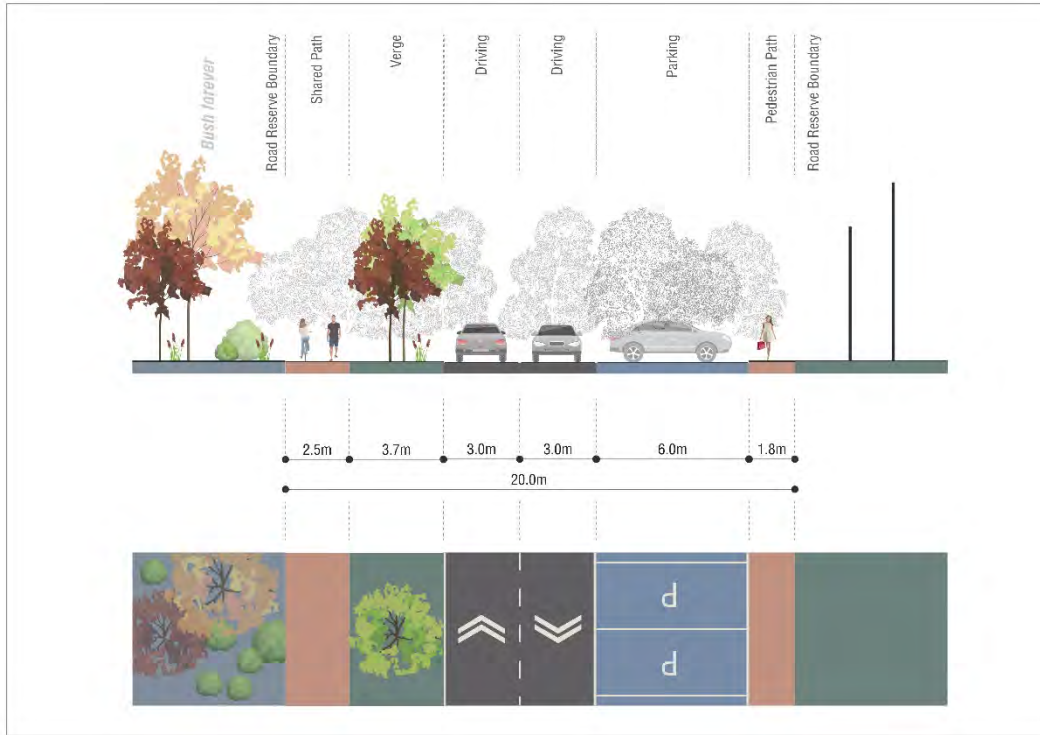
RD19 Brand Road (South of District Open Space) Cross Section
